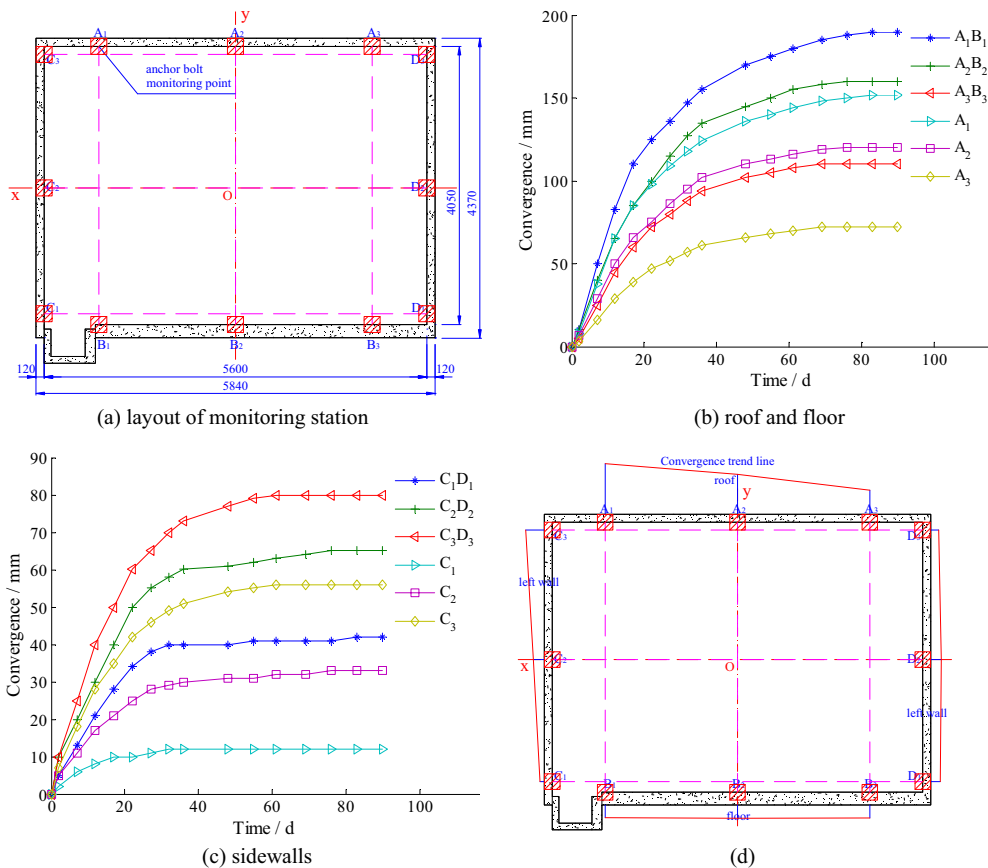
Monitoring station results for roadway roof-floor and sidewall convergence
